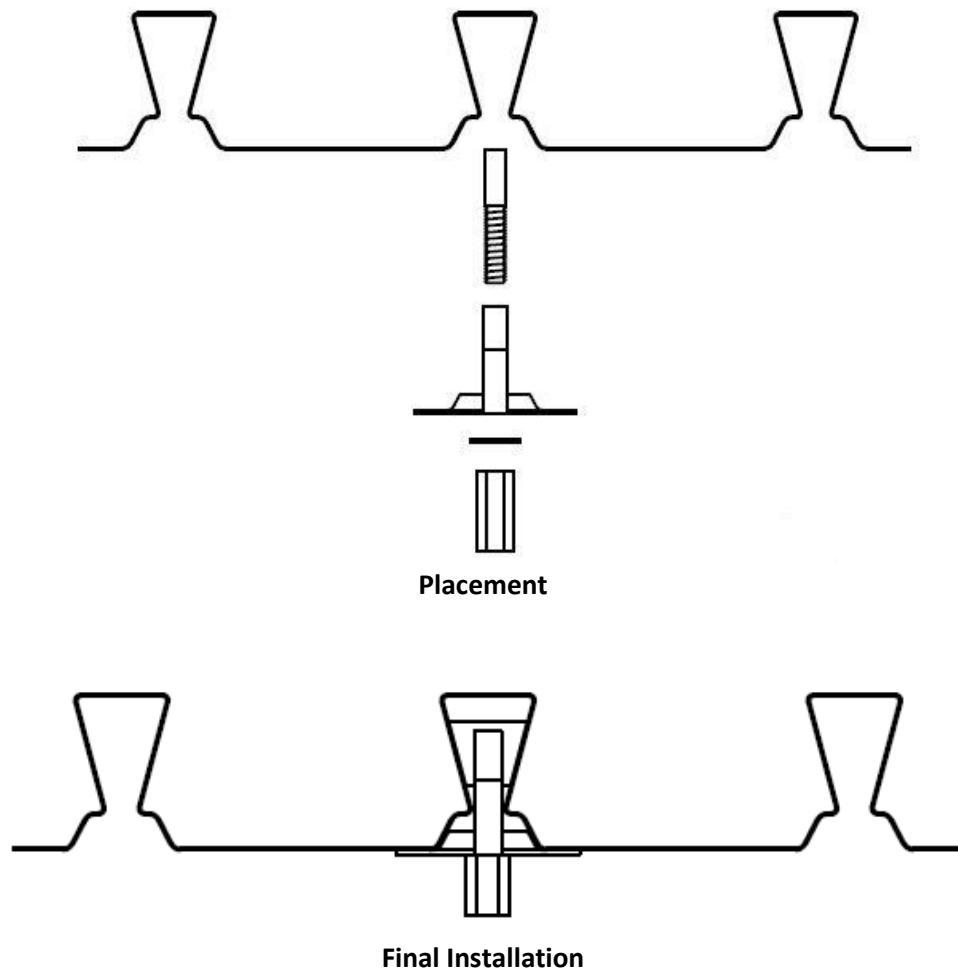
Wedge Bolt Hanger Installation Details for Roof Deck
